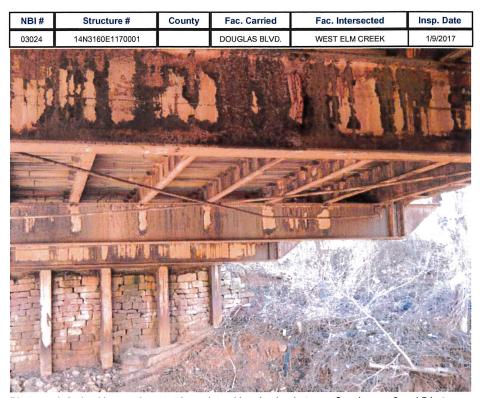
Looking north at the south end of the bridge deck. Note: The longitudinal runners have checks and splits along their length, which appear heavier towards the ends of the bridge.
